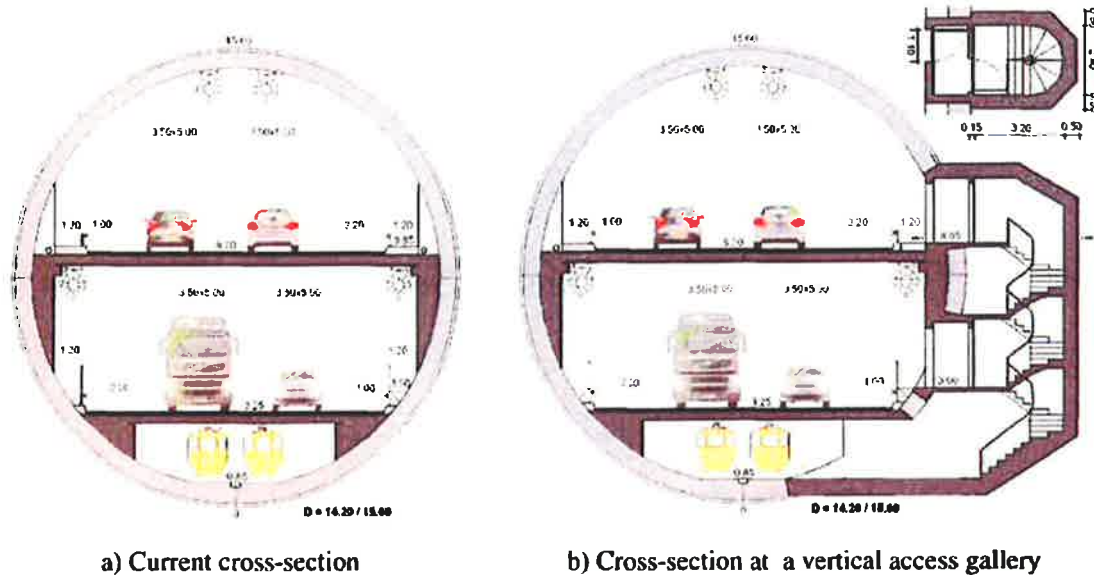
Roadway tunnel of the Alternative TBM tunnel solution
